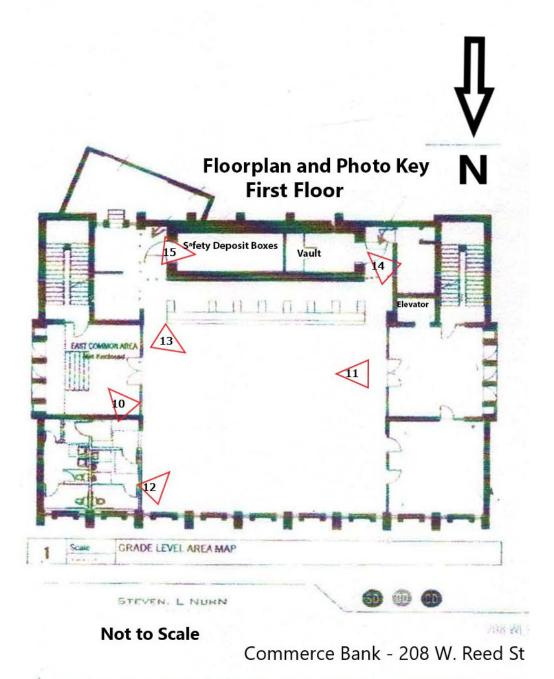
Floorplan (current) and Photo Key for First Floor. Source: Matt Brownfield.
